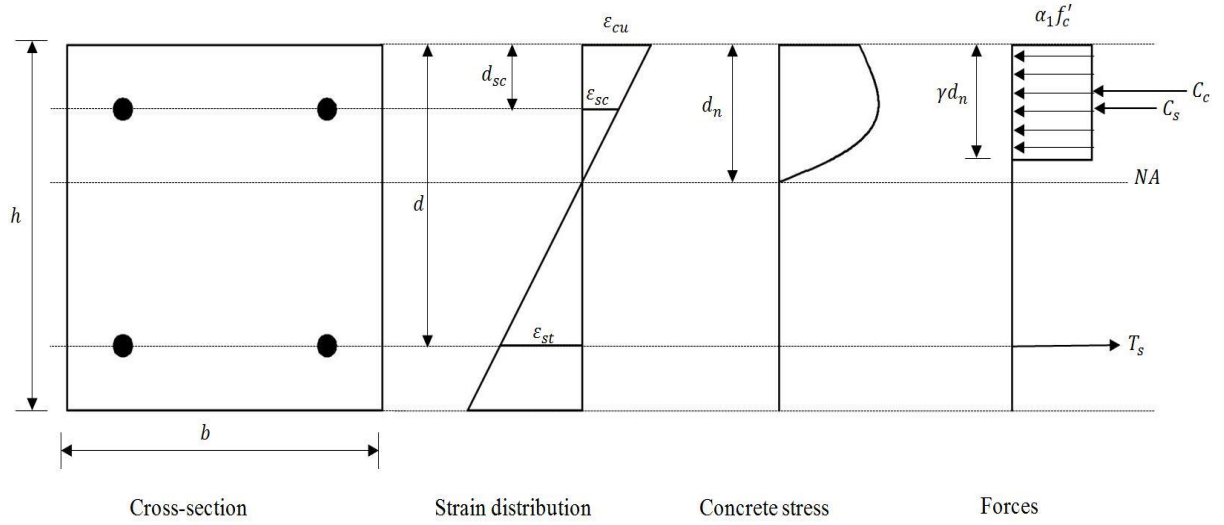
Stress-strain distribution and force equilibrium of steel bar specimens under eccentric axial compression
